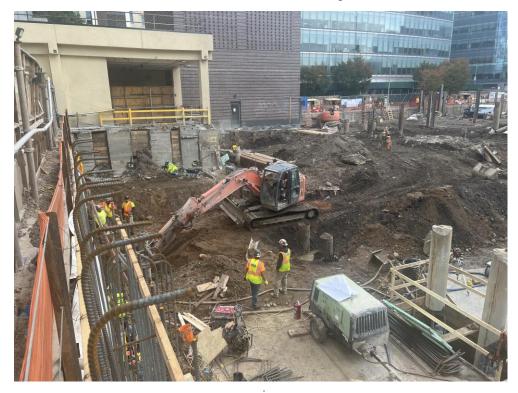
ECD excavating an area in WCG COMP H (facing east).
